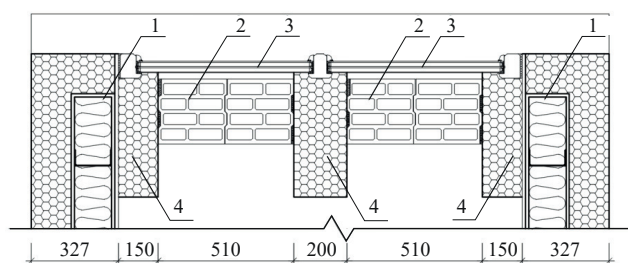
Diagram of the partition structure in the external chamber [35]: 1 – external wall structure of the chamber; 2 – masonry layer of the barrier; 3 – glazing layer; 4 – thermal insulation
